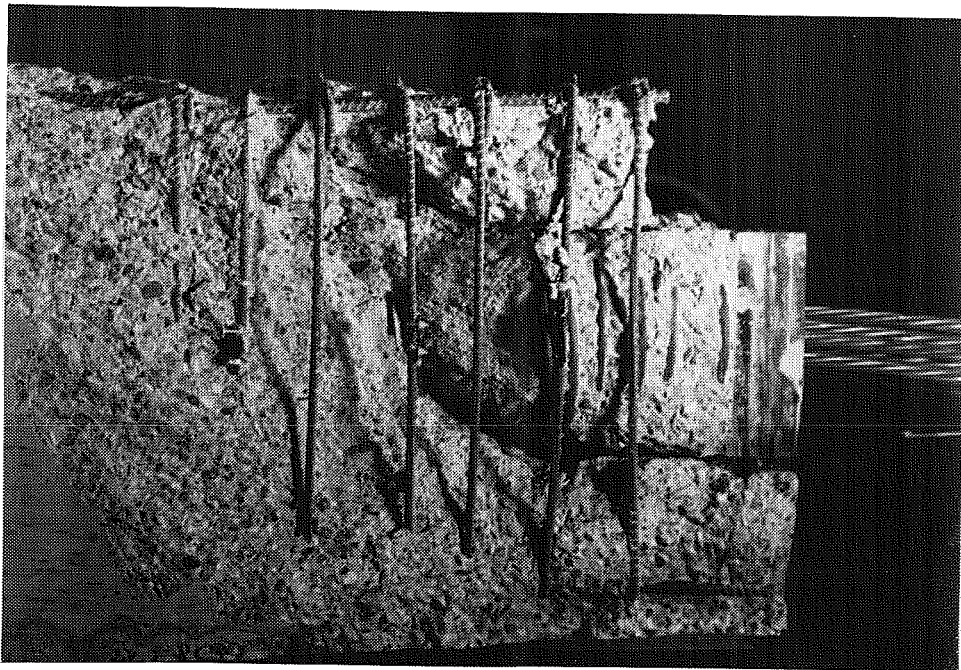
Failure Cone ahead of Spiral (Specimen Beam1)
